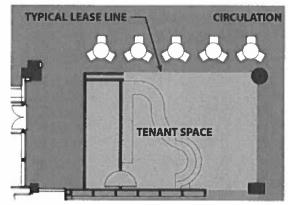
TENANT SPACE - COURTYARD - PLAN
